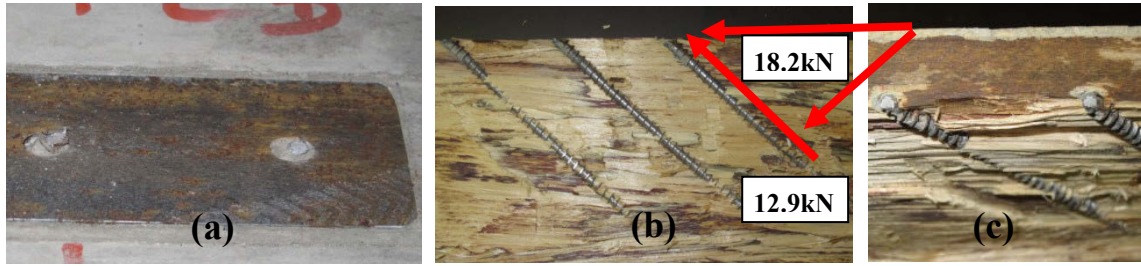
Failure of (a) head of screw in concrete (b) opened specimen and (c) tensile and shear failure of the SPAX screws
